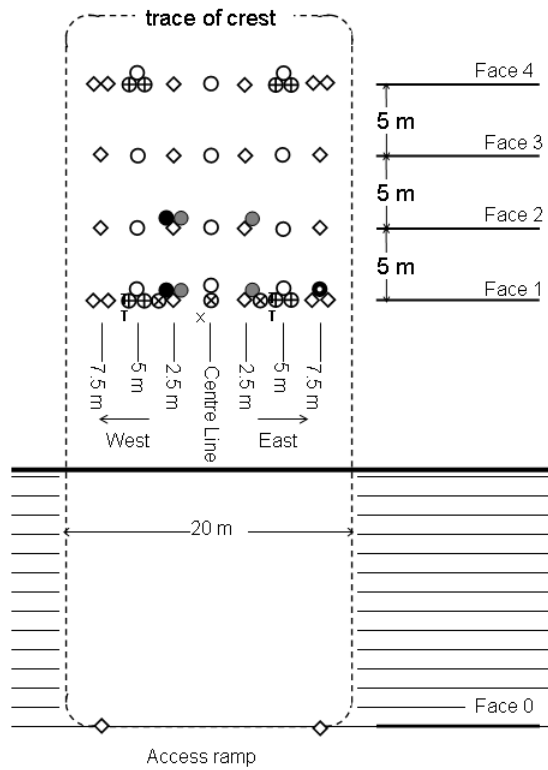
Type I pile Face 0 (transition between access ramp and pile) dimensions and instrument distributions
